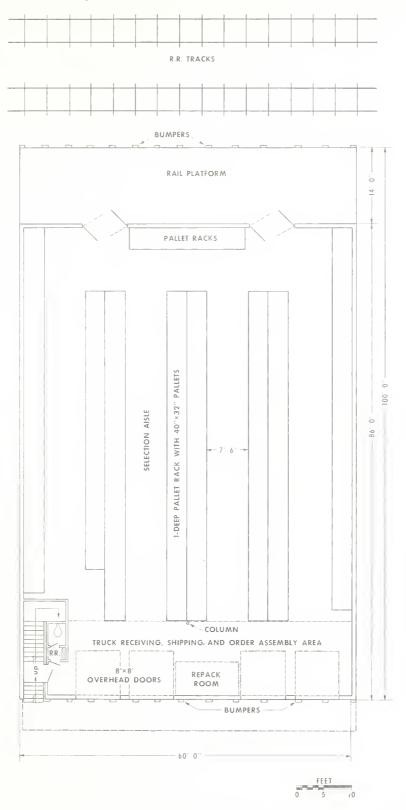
Internal arrangement for an institutional wholesale grocery firm using two units of a multipleoccupancy building.
